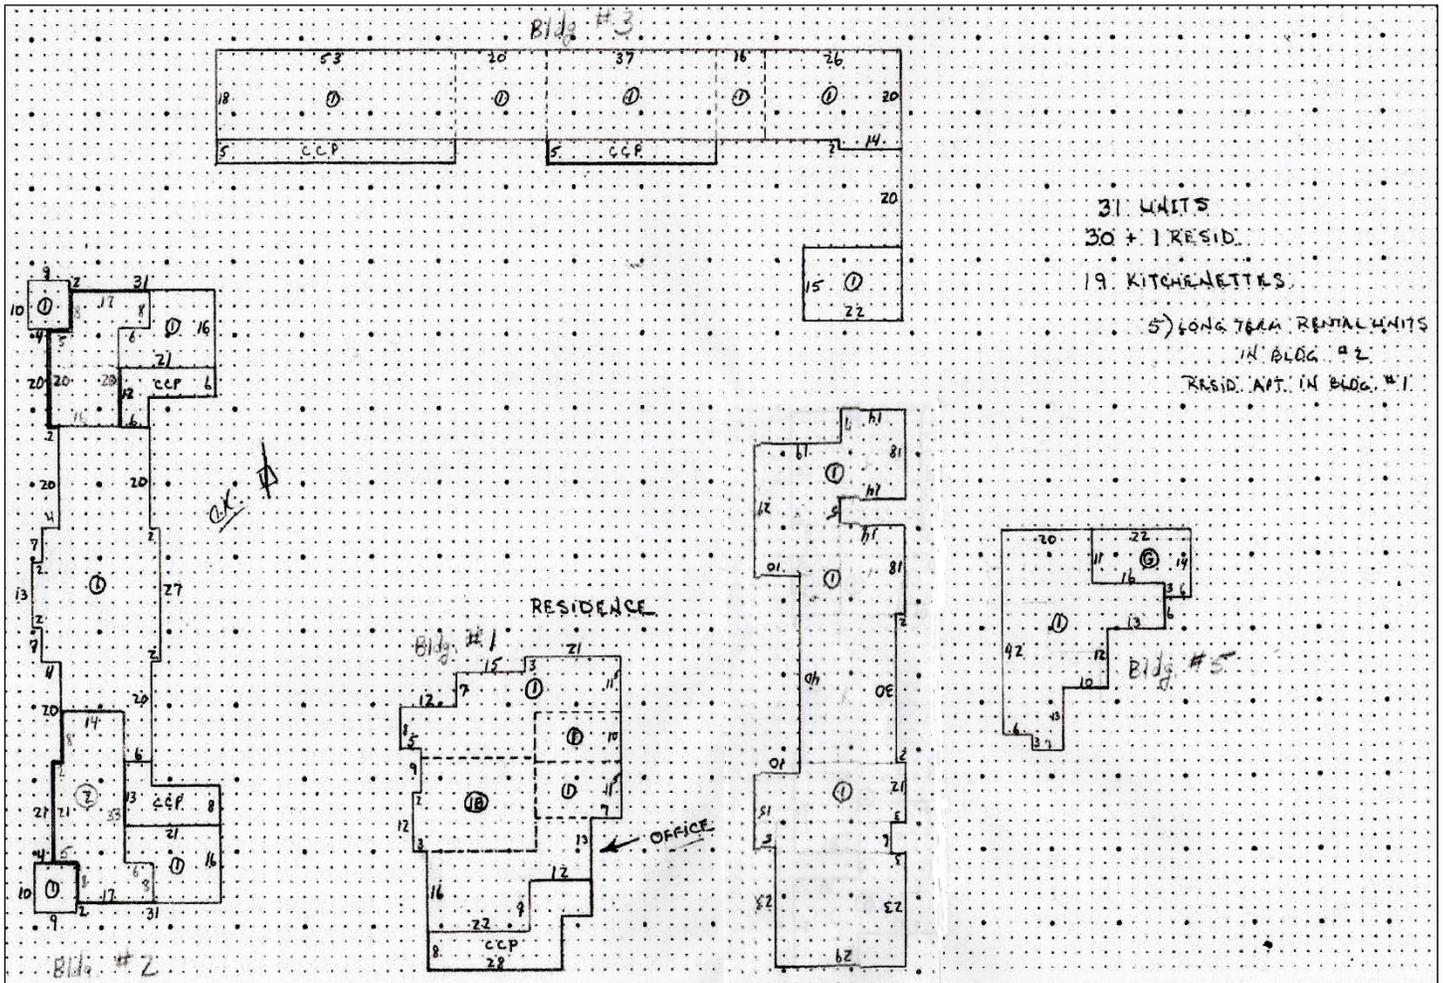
North is to the left and Lake Avenue is toward the bottom. Note that the building west of Resource 3 had not yet been attached to that guestroom building, and the residence does not have its two-story rear addition or courtyard. Building 4 (right of the "residence") was not correctly oriented in the original map; it has been rotated 180° clockwise to produce this illustration. SOURCE: Pueblo County Assessor, appraisal card sketch map, ca. 1974.
